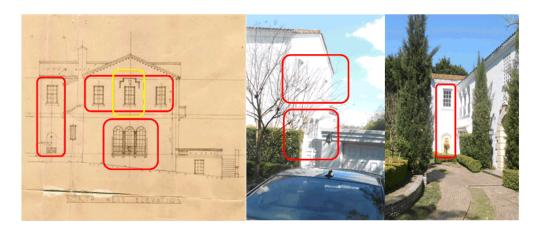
(L) Northern elevation of the 1928 Gilling Plan, (C) oblique view of the northern elevation gable element, and (R) the Gilling Scheme window and fountain element, 2015. Note the central opening to the upper level window has been filled in during the 1960 cheme.
